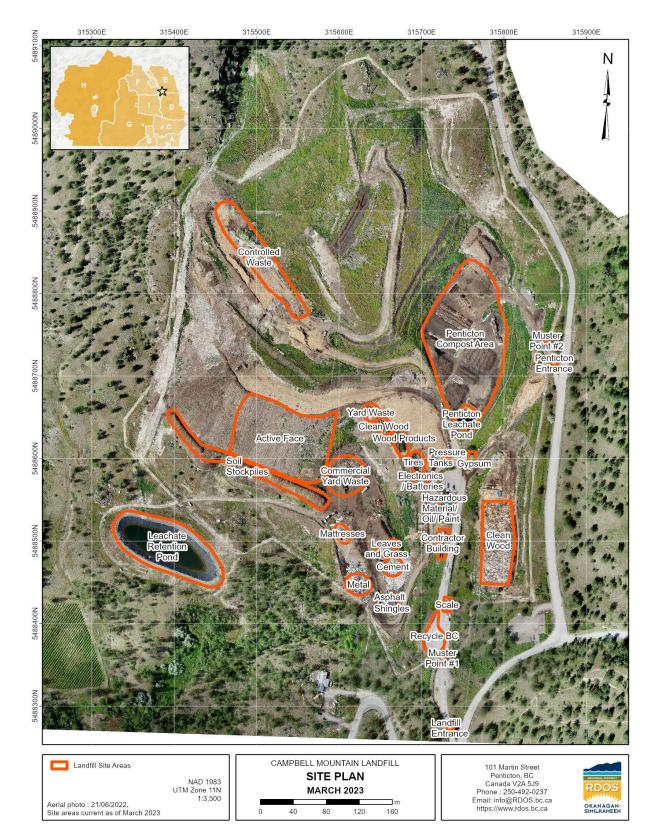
Figure I (a): March 2023 Site Plan of Campbell Mountain Landfill
